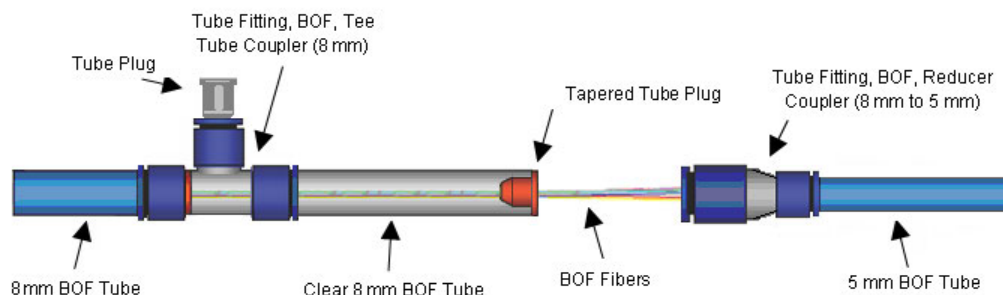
L1-10. Feeding the blown fibers into the BOF 8-to-5-millimeter reducer coupler (with 5-millimeter BOF tube).
